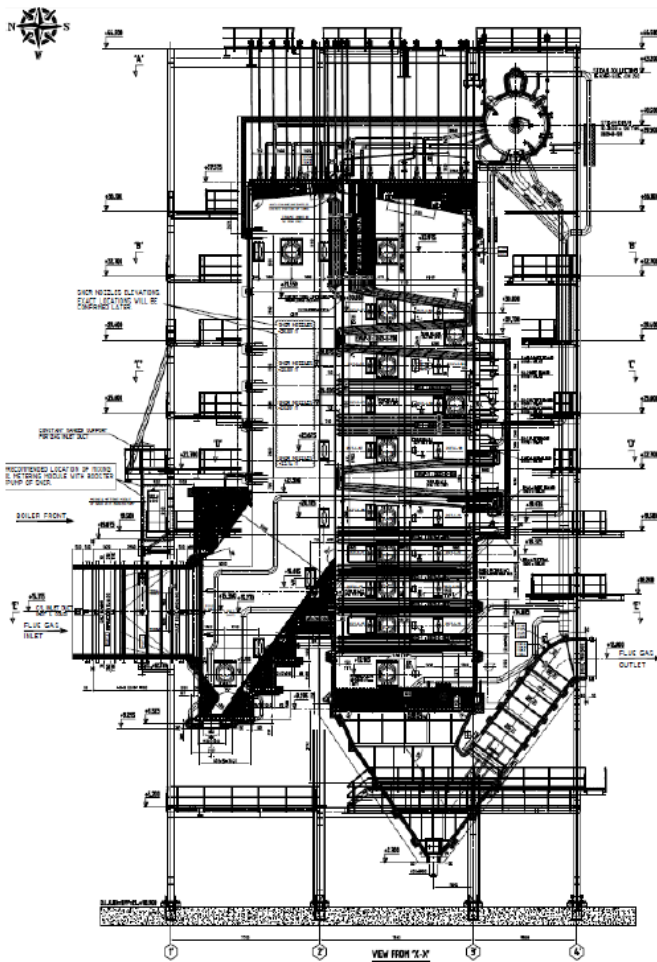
Waste Heat Boiler (Typical Arrangement)
